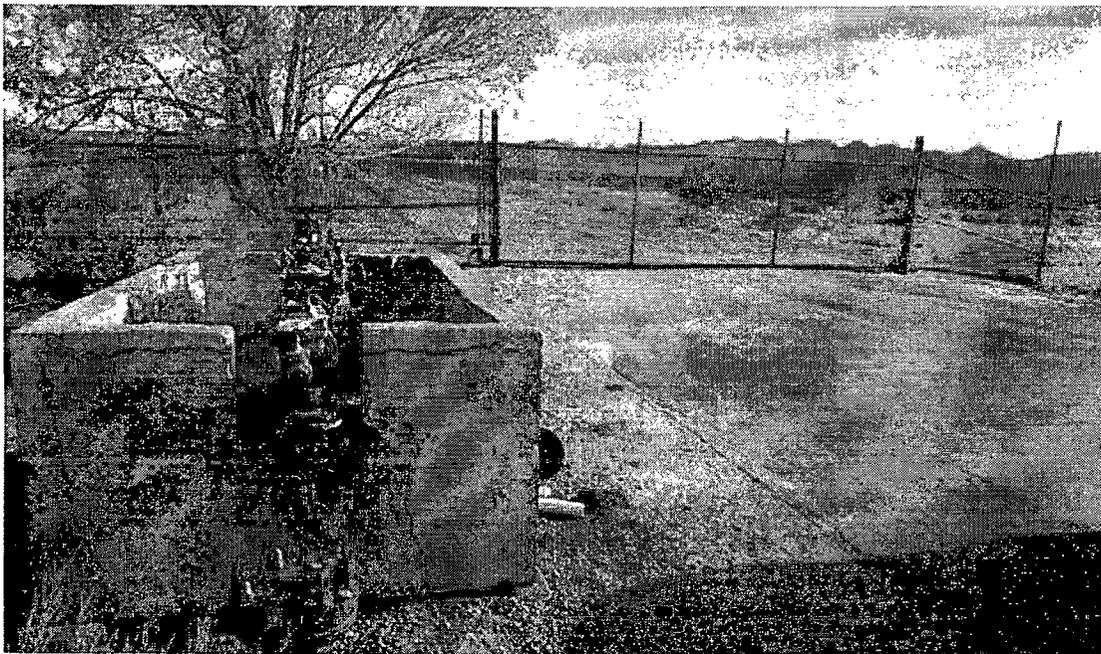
Proposed Connection Location at Boulder City WWTP
